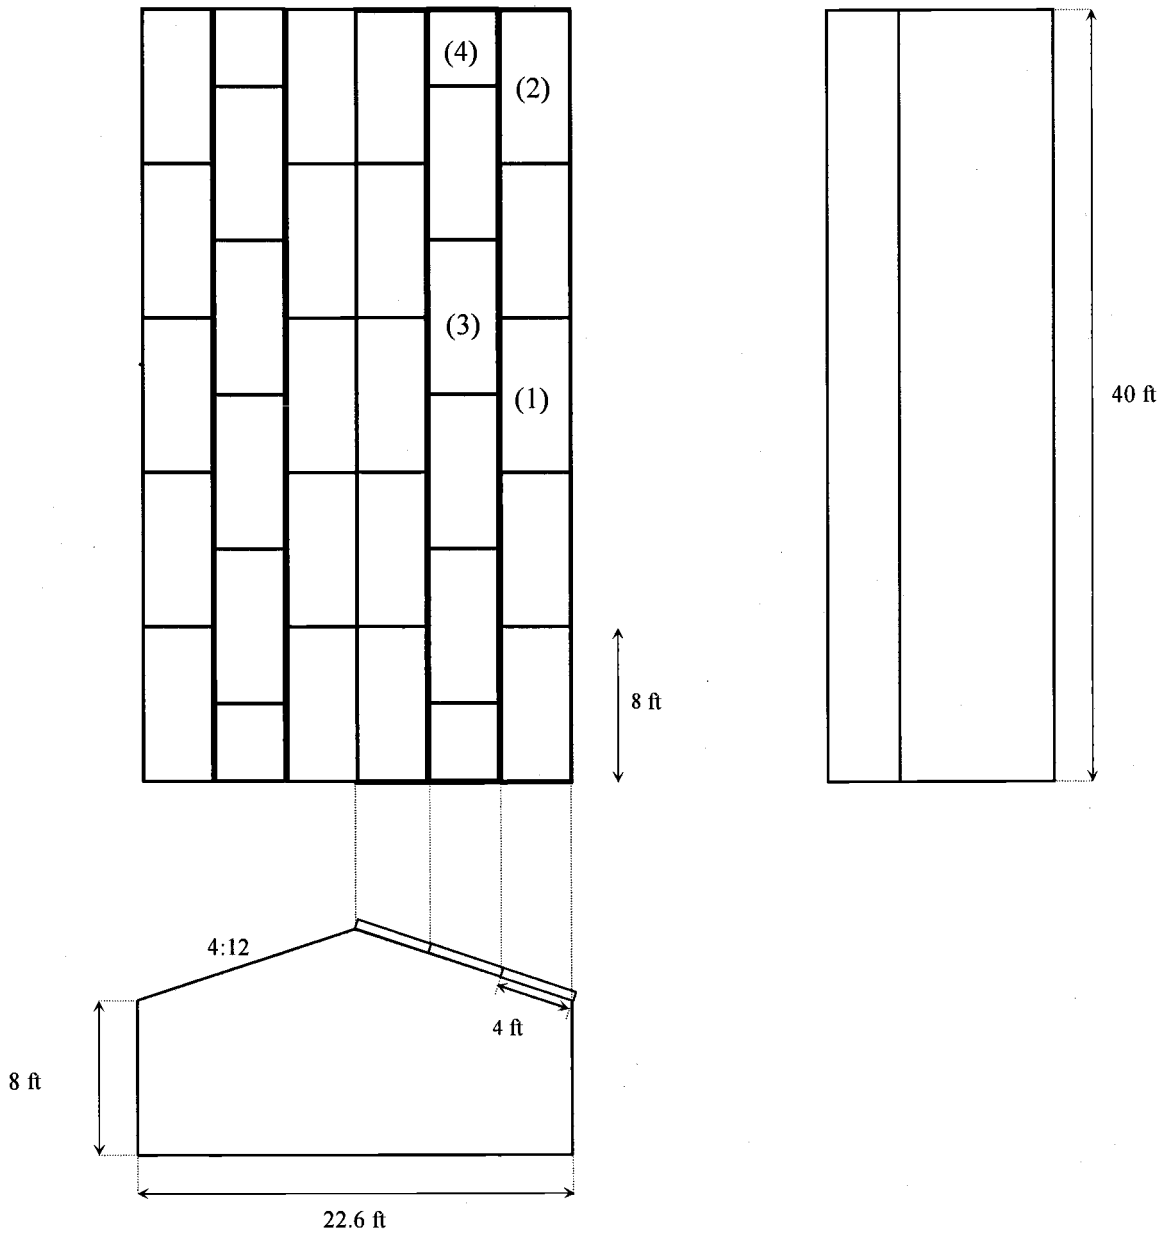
Dimensions and panel layout showing 4 panel locations, Structure Type 1
